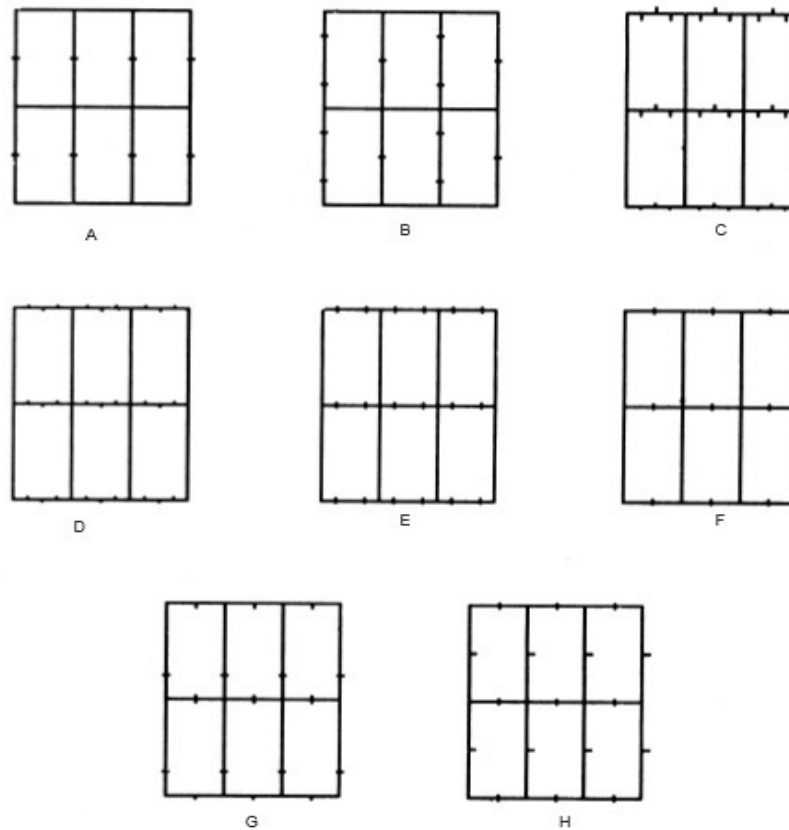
Stone Veneering (Typical Fixing Arrangement)
